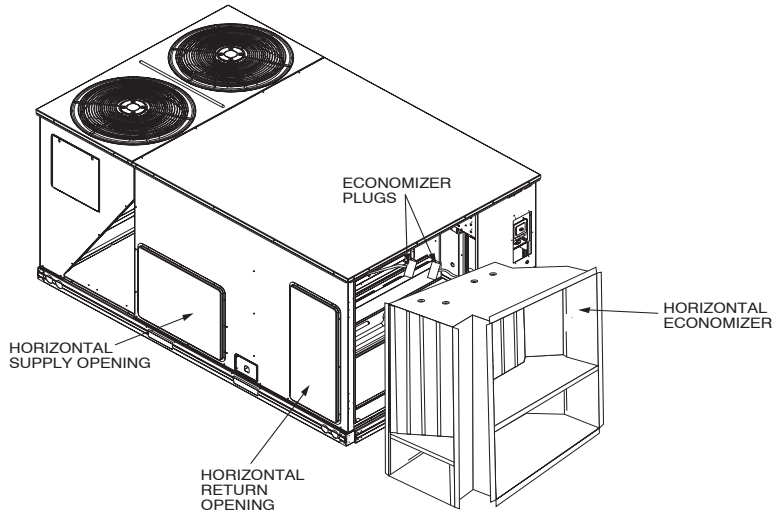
Installing Horizontal Economizer Assembly (8-14 Size Shown)
